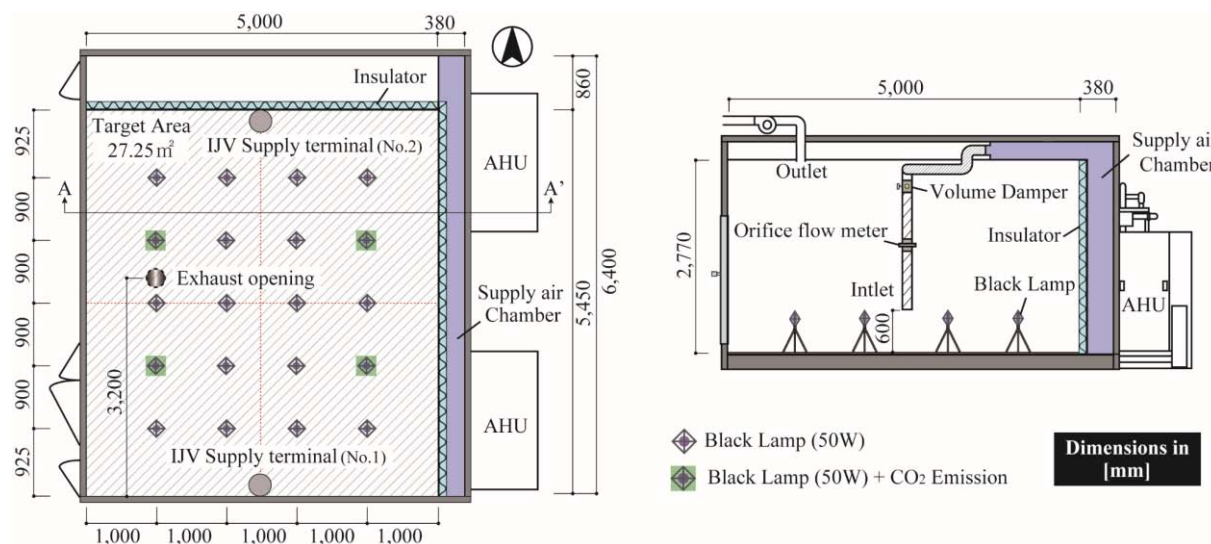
Floor plan and A-A' Cross-Section of the climate chamber
